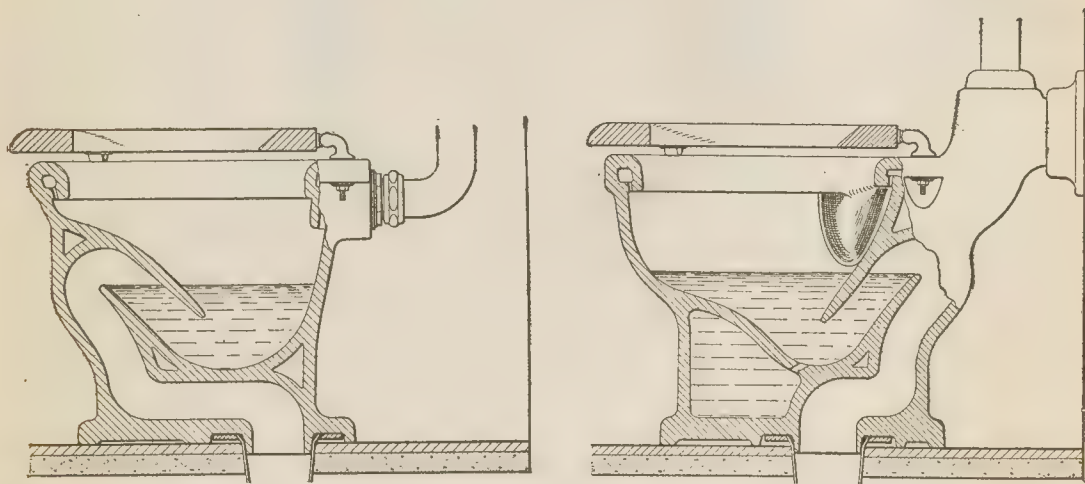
,572.—Mott, Lombard, syphon jet water closet with non-soil flushing rim. Water surface 12×16 ins., depth of seal 3 ins.
